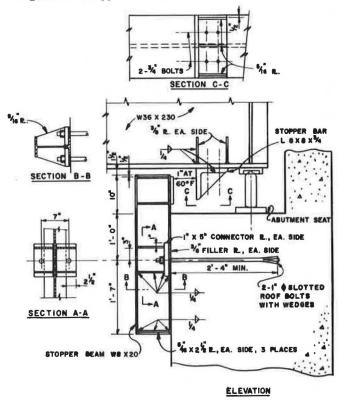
Girder longitudinal displacement stopper at abutment retrofit concept.
